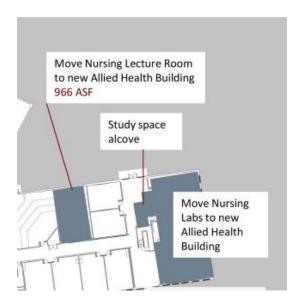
Figure M.Rampart Range Campus Project Implementation Plan, Second Floor Main Building. Source: Hall Architects.
